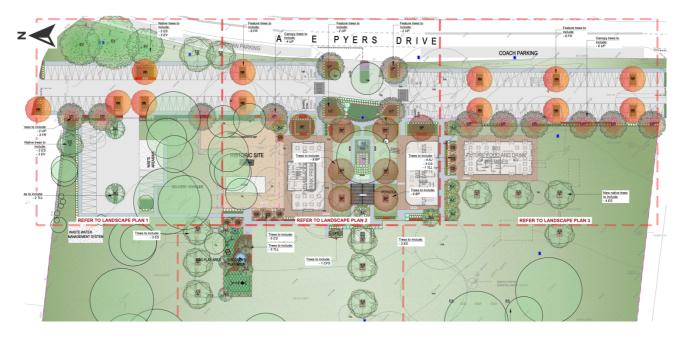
Extract from the landscape plans showing an overview of the proposed landscape works
